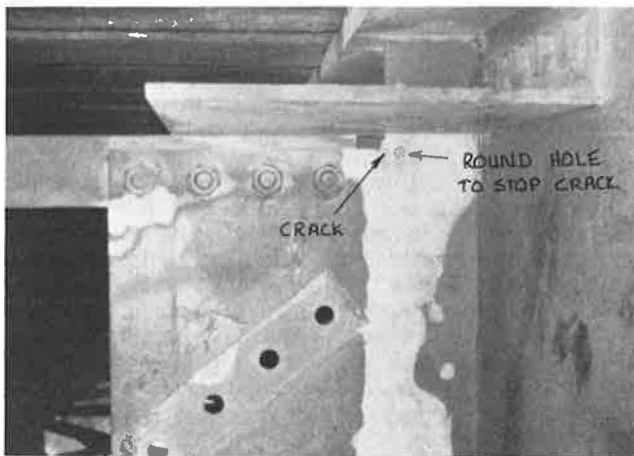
Connection of brace frame angle to stiffener that has gusset groove welded to stiffener.
